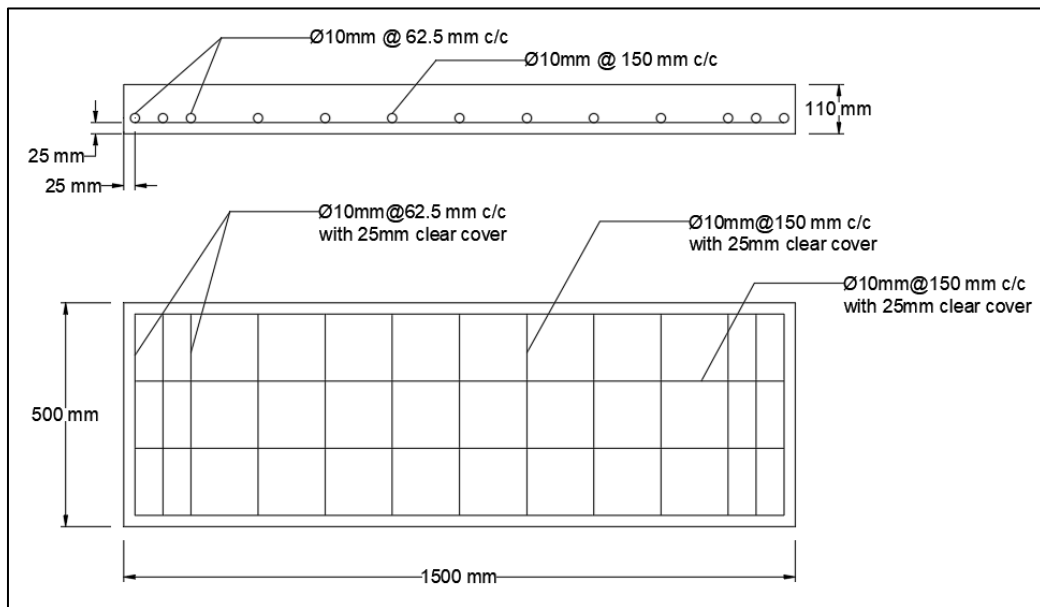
Dimensions and Reinforcement of Typical Specimen
